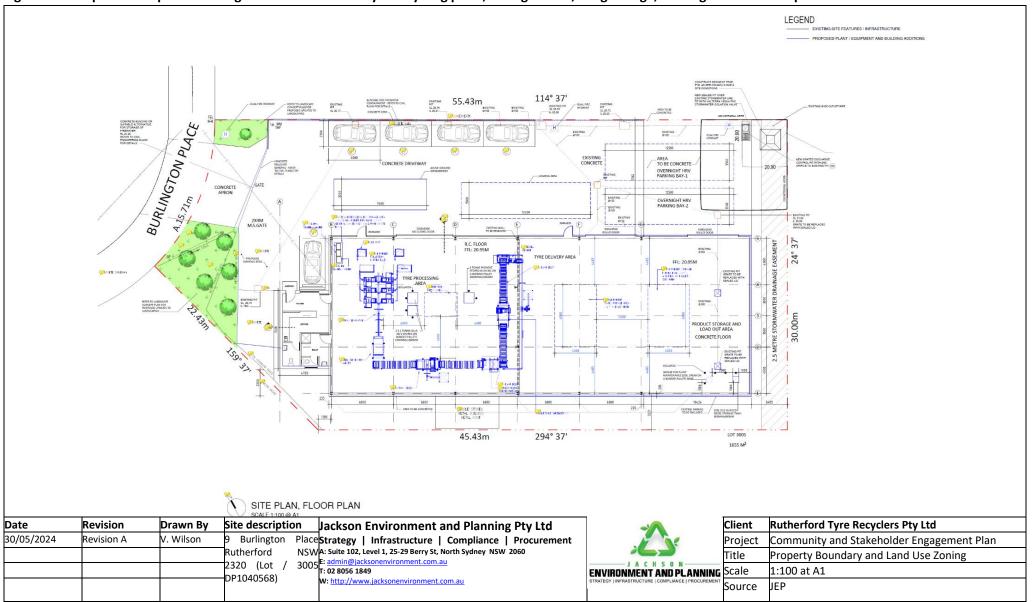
Proposed site plan outlining the location for the tyre recycling plant, storage areas, weighbridge, loading area and car spaces.
